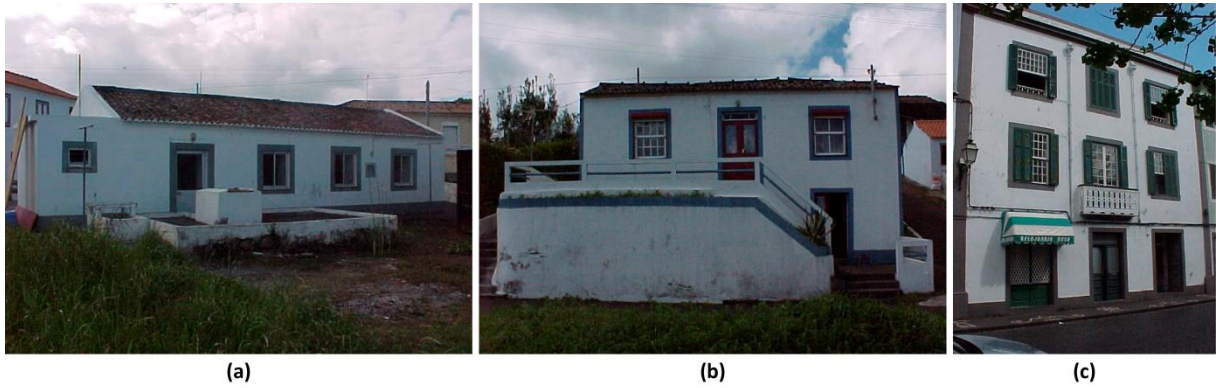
Examples of typical traditional Azorean masonry construction types in the island of Faial present in the selection: (a) one-floor rural building; (b) two-floor rural building; and (c) three-floor urban building
